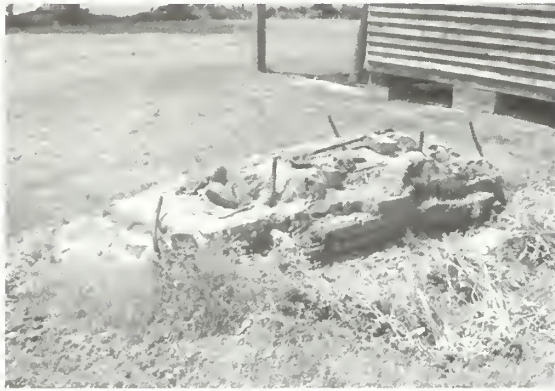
View to southwest of brick foundation for steam engine. (NPS-SERO-CRS, 2001)
